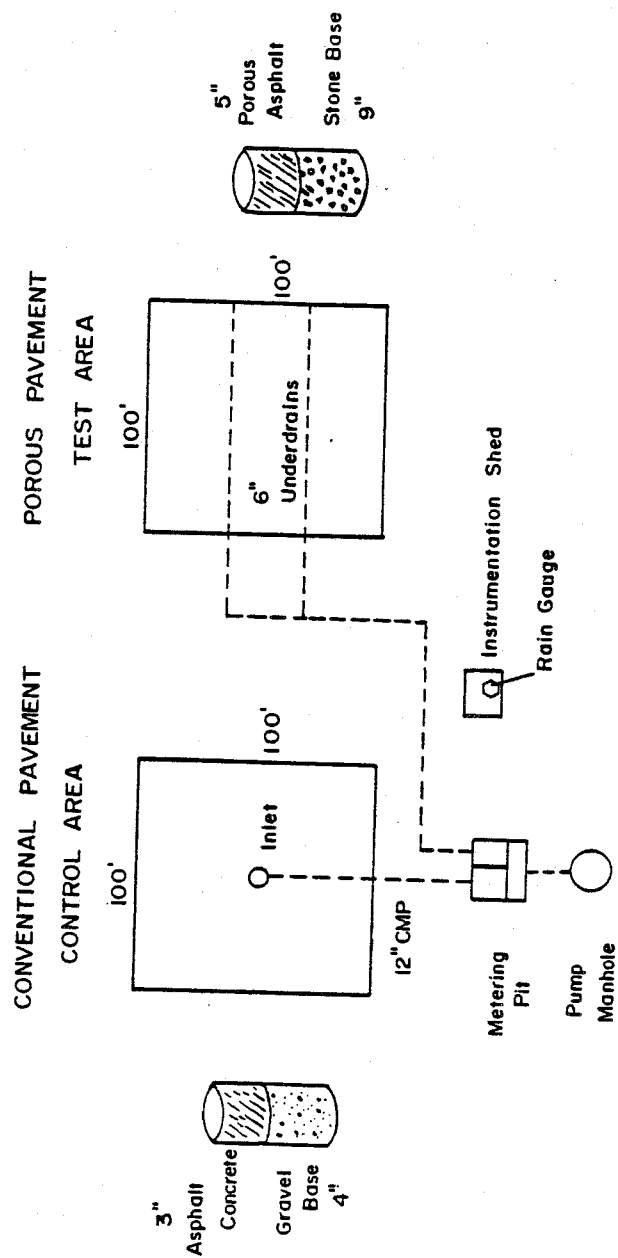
Schematic of porous pavement demonstration site at the GCO treatment plant.
